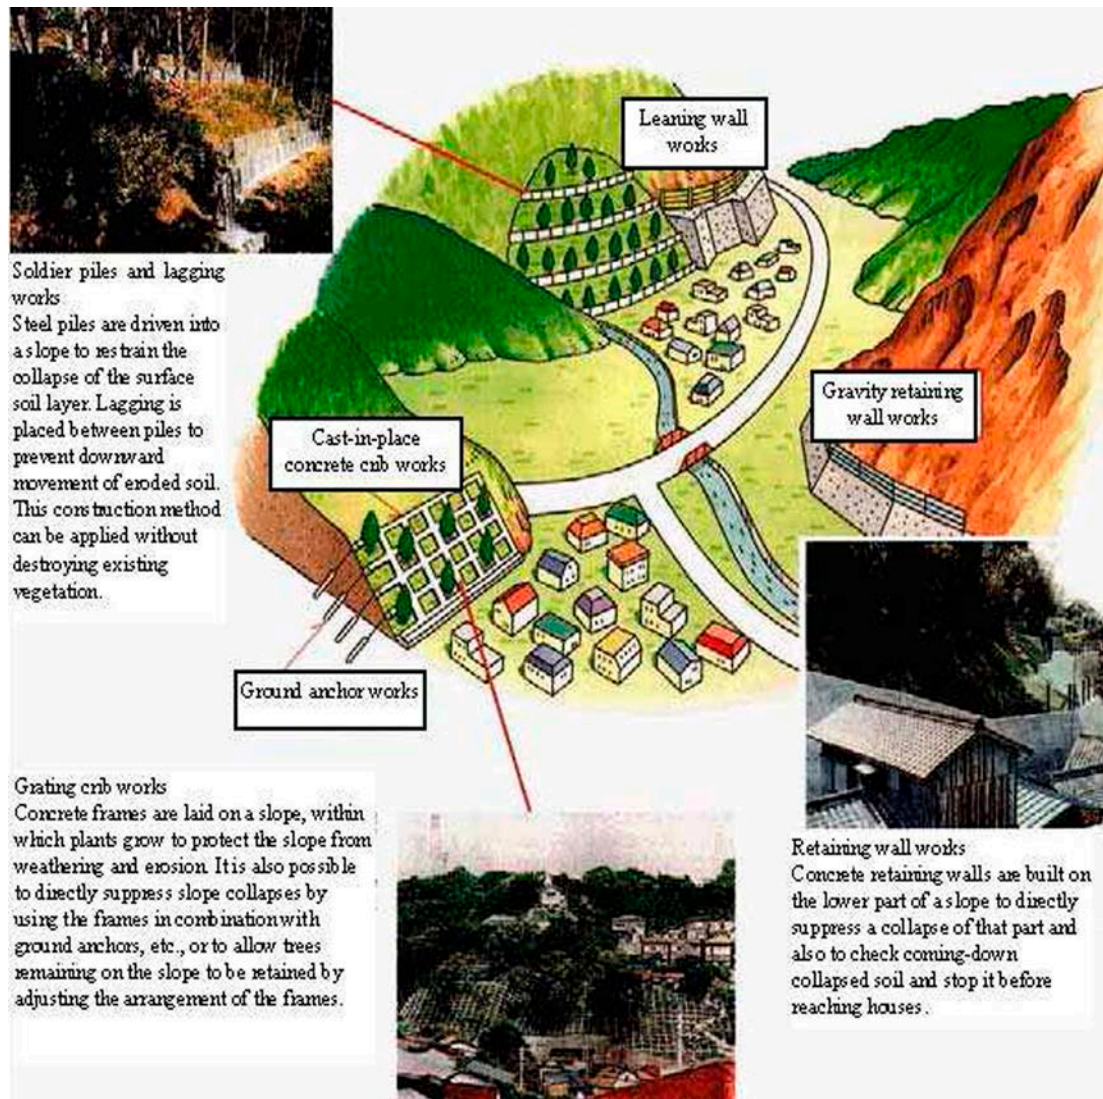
Preventive measures against slope failures (MLIT, 2010)
